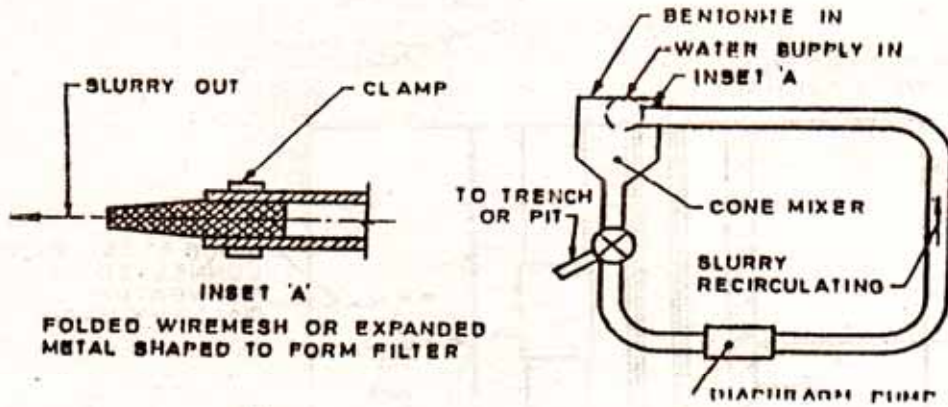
FIG. A SPECIAL NOZZLE AND SLURRY MIXING PLANT
